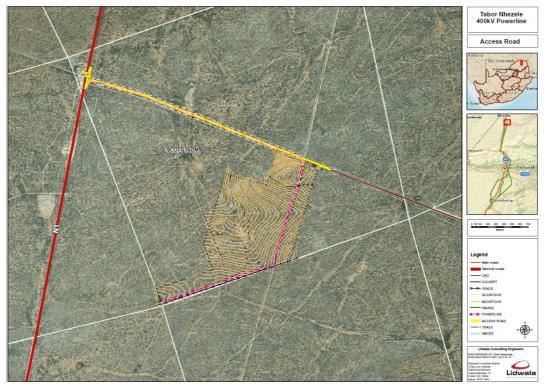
Proposed formal access road to the proposed new Nzhelele substation
